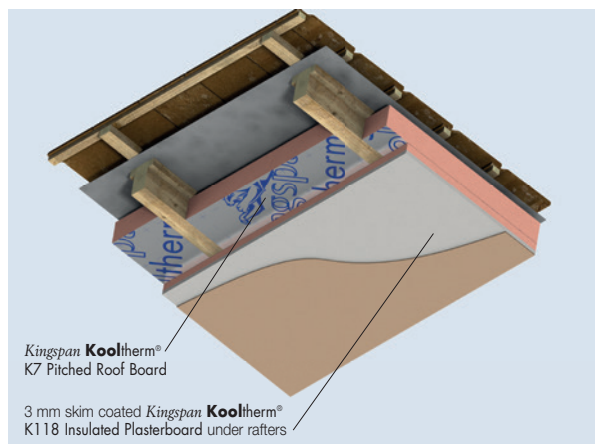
Mechanically Fixed to Timber Rafters with Kingspan Kooltherm® K7 Pitched Roof Board Between Rafters
